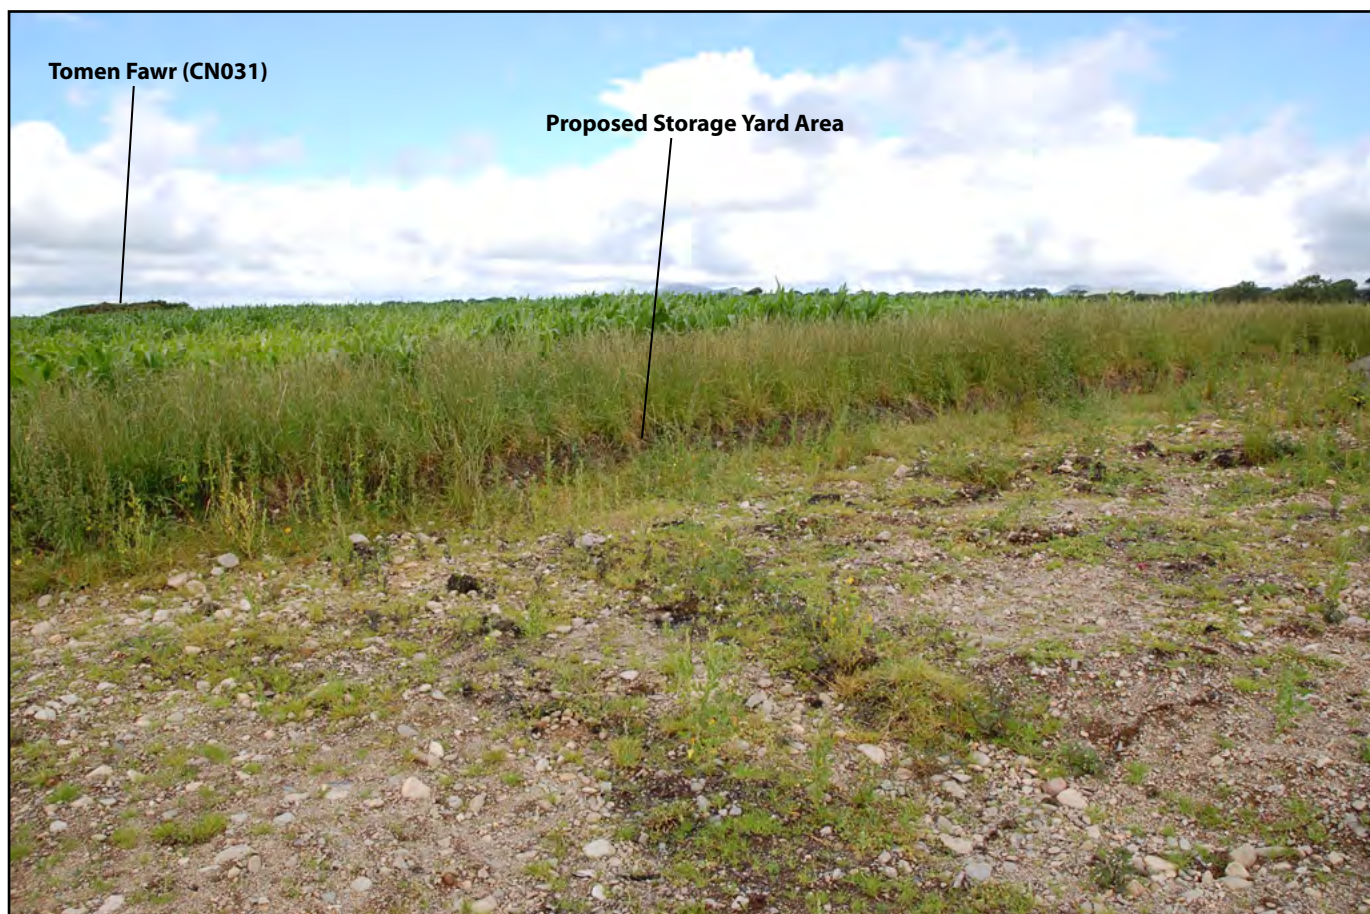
View West of Proposed Storage Yard Area (Note that it has already been partially stripped)
